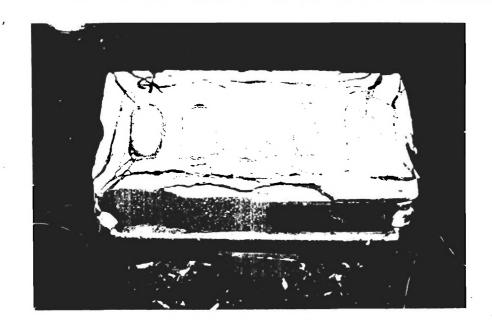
View of fractured G brick with 1/8-in. TFE contact material.
